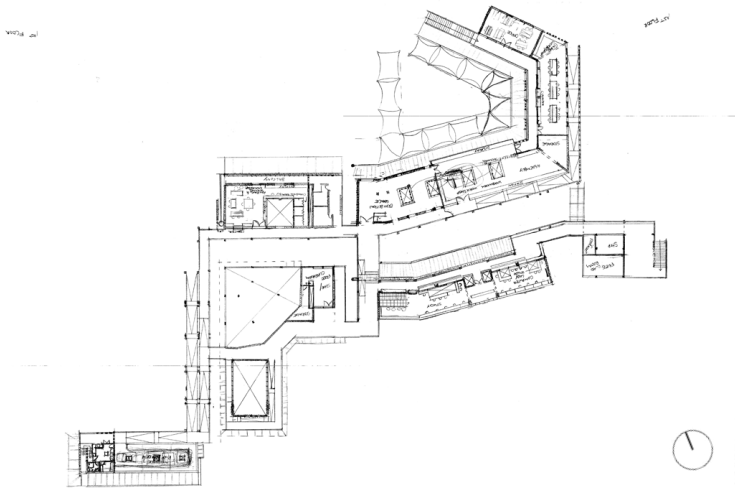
Sketch plan First Floor at 1:200 (Author 2021)
